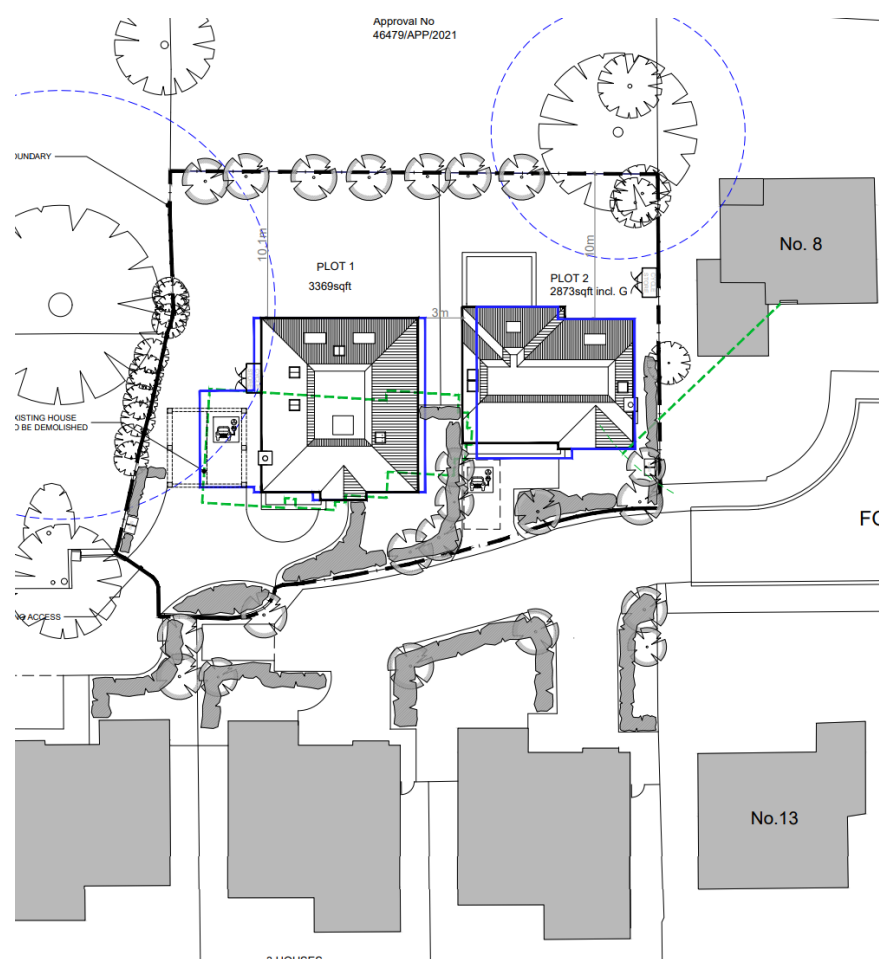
Proposed site plan including blue line which illustrates previous pre-application scheme
